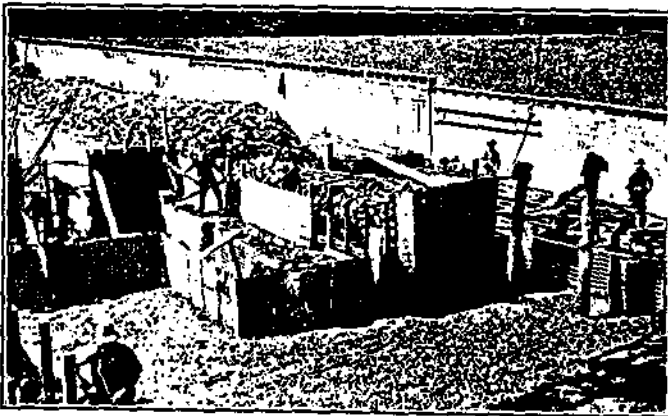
Box being Poured. Showing also Corrugated Iron Forms and Collapsible Steel Tubes for Drainage Ducts.
